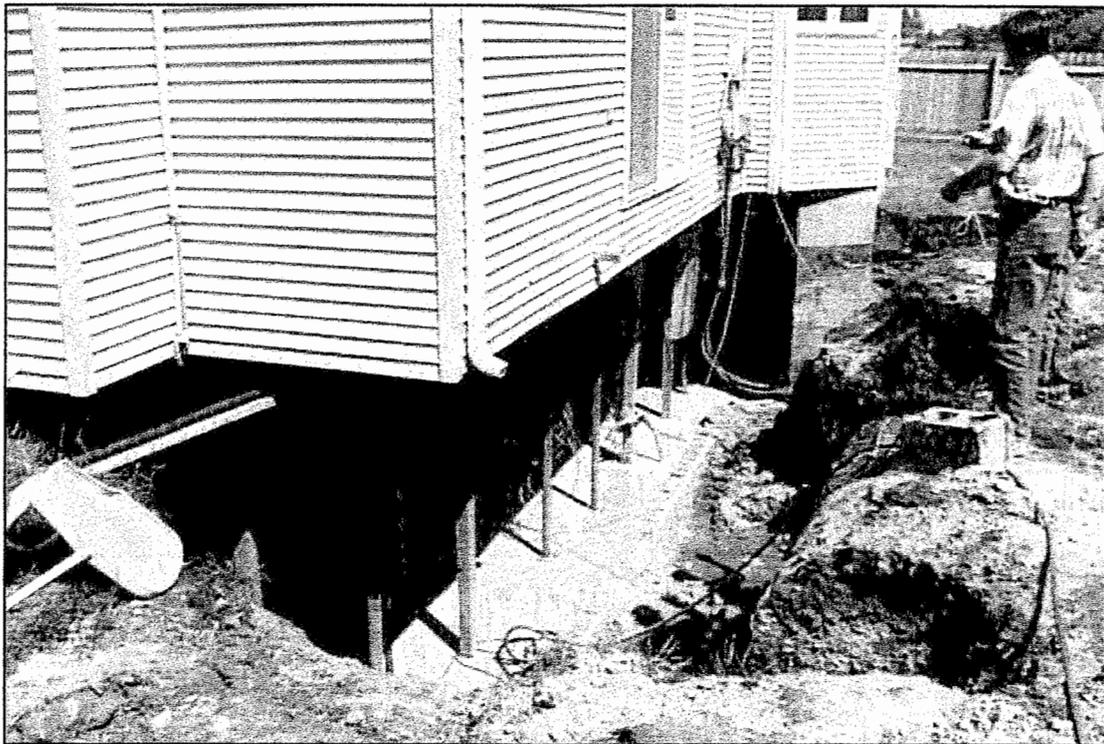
Failure of this unreinforced masonry basement during flooding in East Grand Forks, MN, in 1997 caused approximately \$32,000 in damage.
